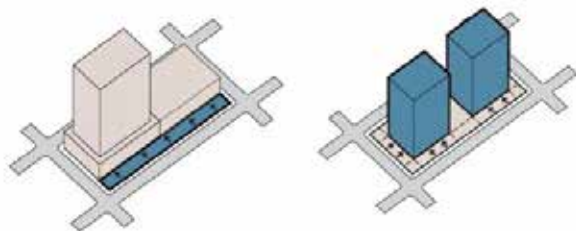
Ground Floor Setbacks for Wider Footpaths and Landscaped Streets
